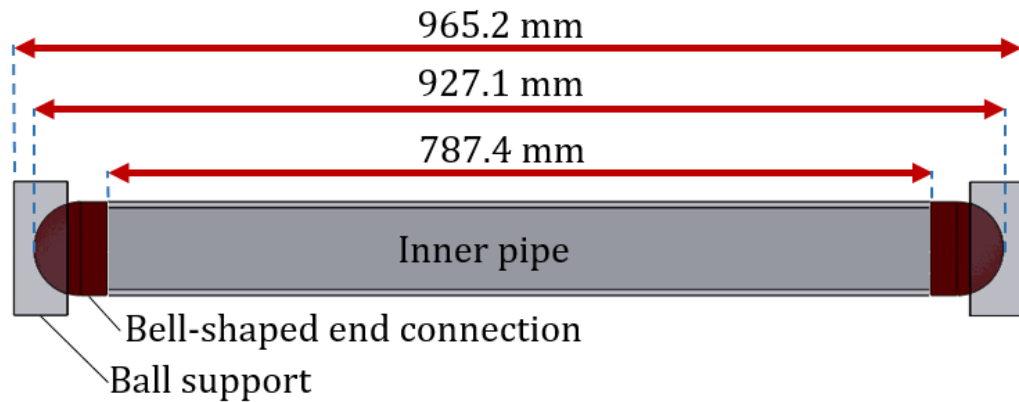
A Schematic View of the Inner Pipe Assembly Including the Inner Pipe and Bell-Shaped End Connections Which is Mounted by the Ball Supports
